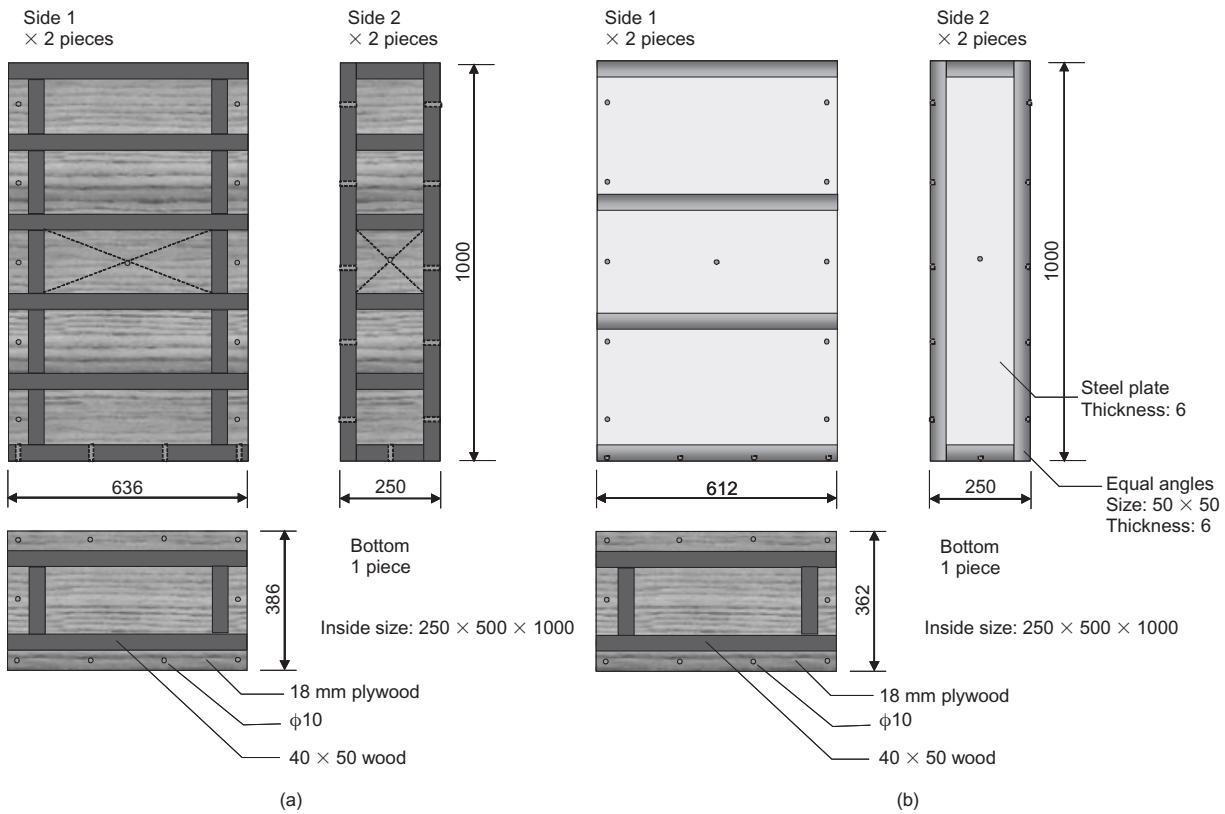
Design charts for formworks with section thickness of 250 mm: (a) plywood formwork; (b) steel formwork (all dimensions in mm)
